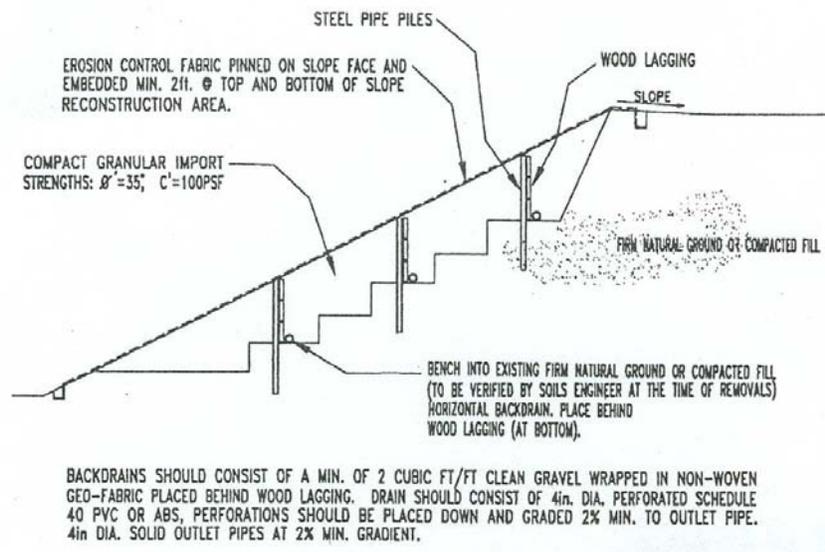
Pipe pile and wood lagging repair (Day, 1997).
